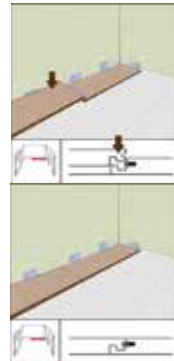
Place the second board into the first board and firmly press the end lock till you hear a click.
